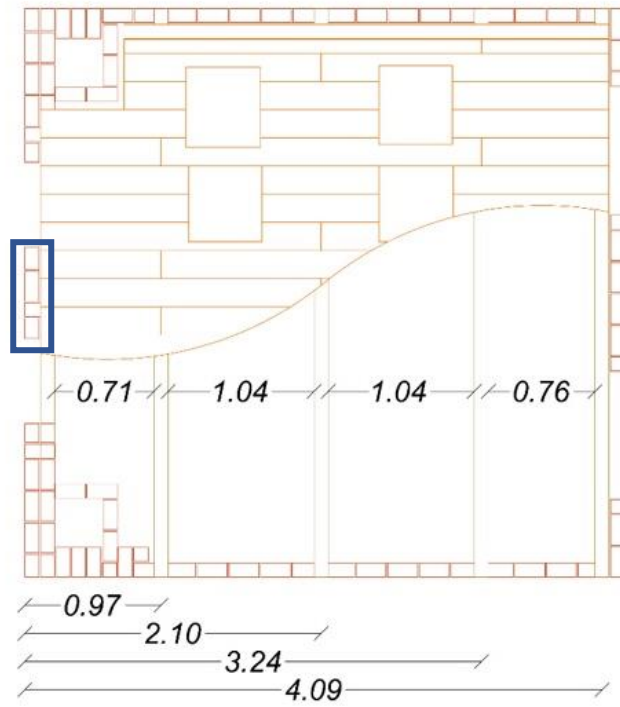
First-floor plan of the building prototype: location of the South parapet [4, p. 5]
